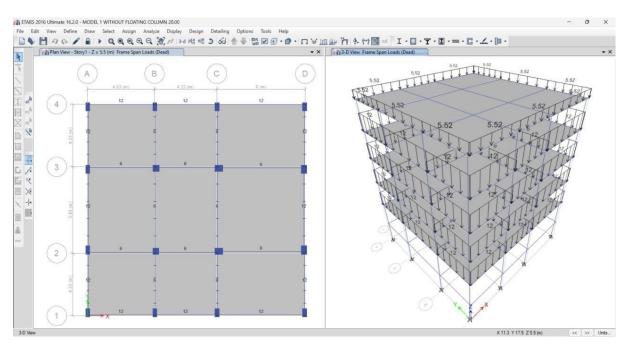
Model 1 – Application of External & Internal Wall load on beams
